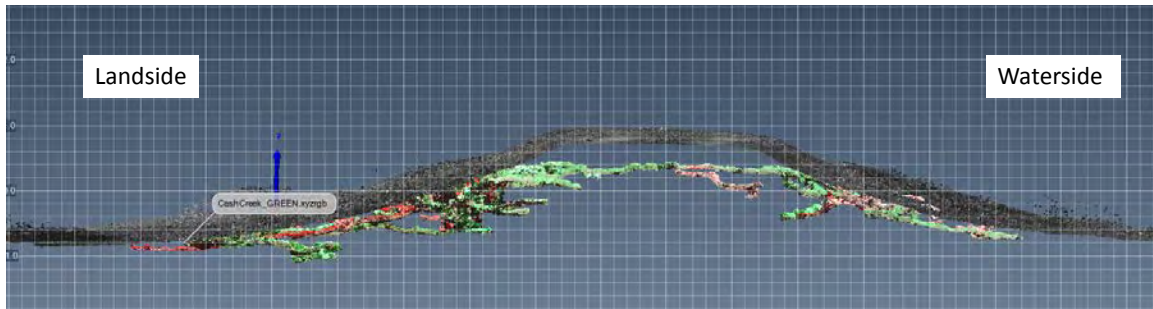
Cross section view of completely penetrating burrow through the clayey levee
